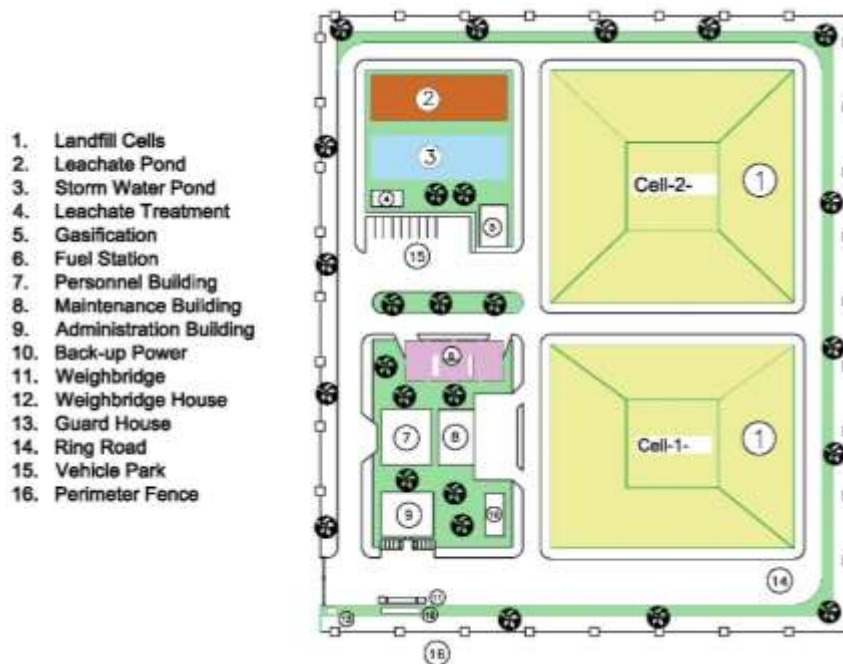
Concept Layout of Prospective New Sanitary Landfill
